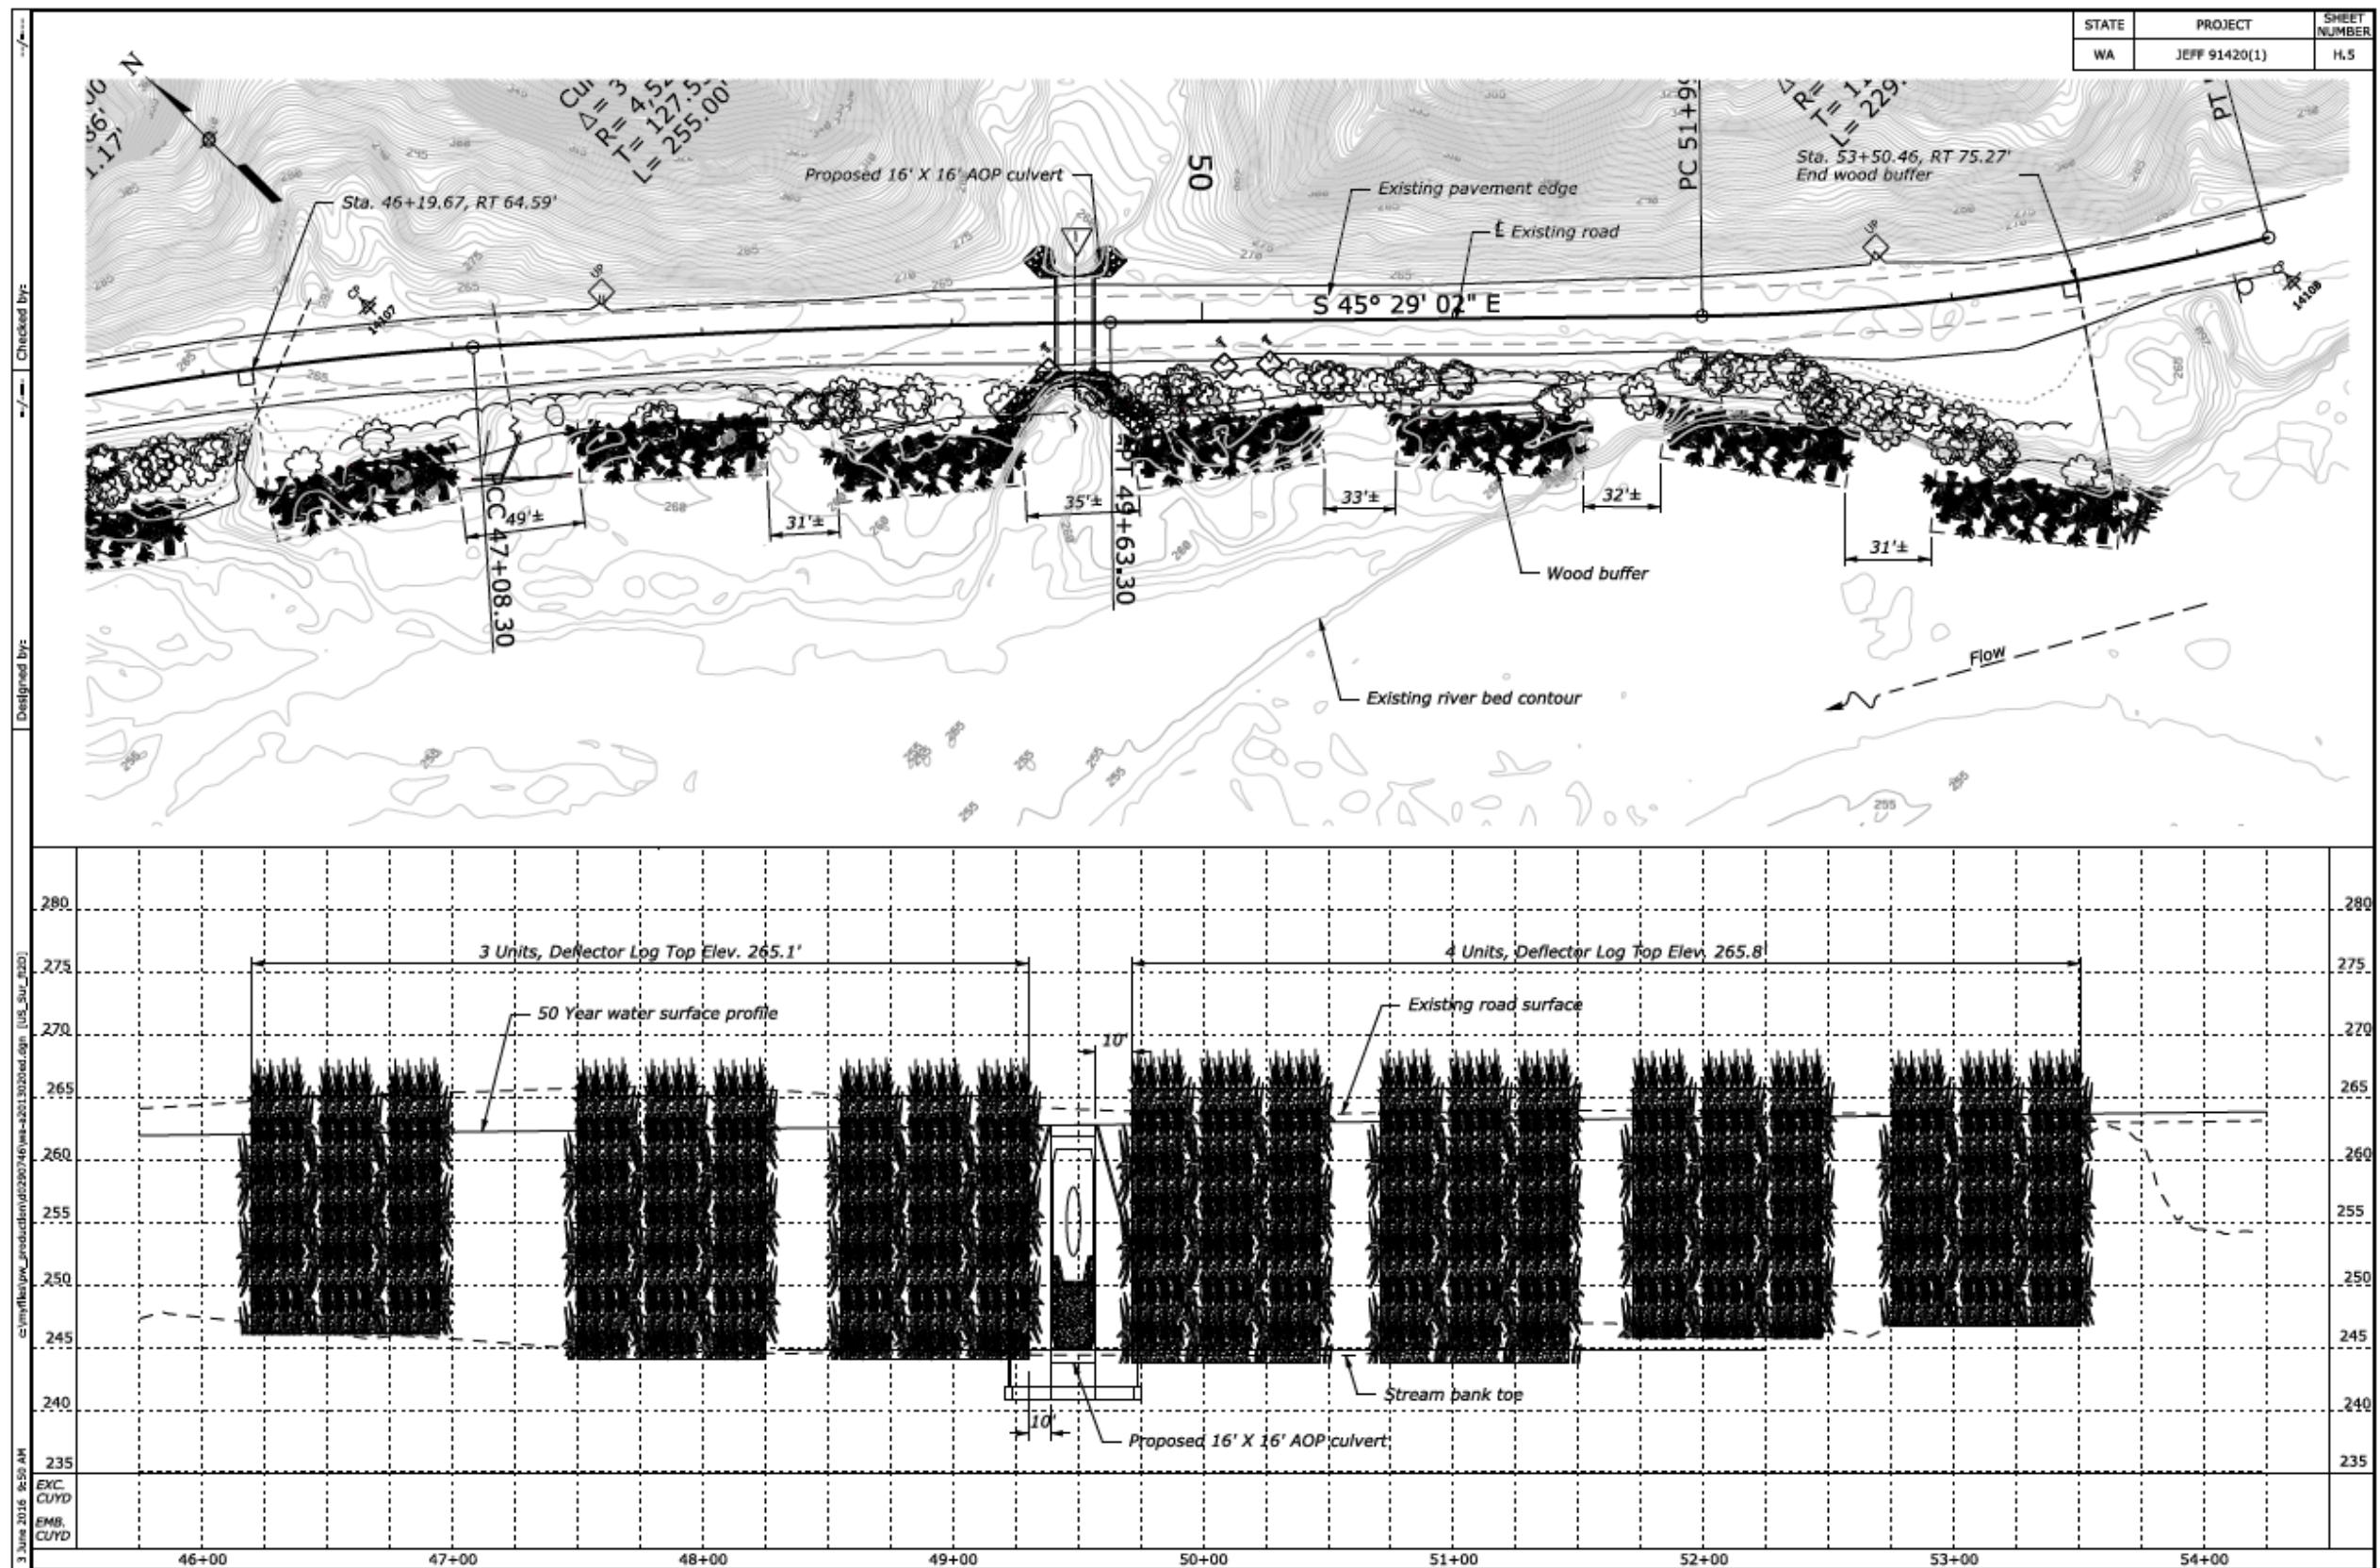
Hoh River Bank Stabilization – Plan sheet for site.
